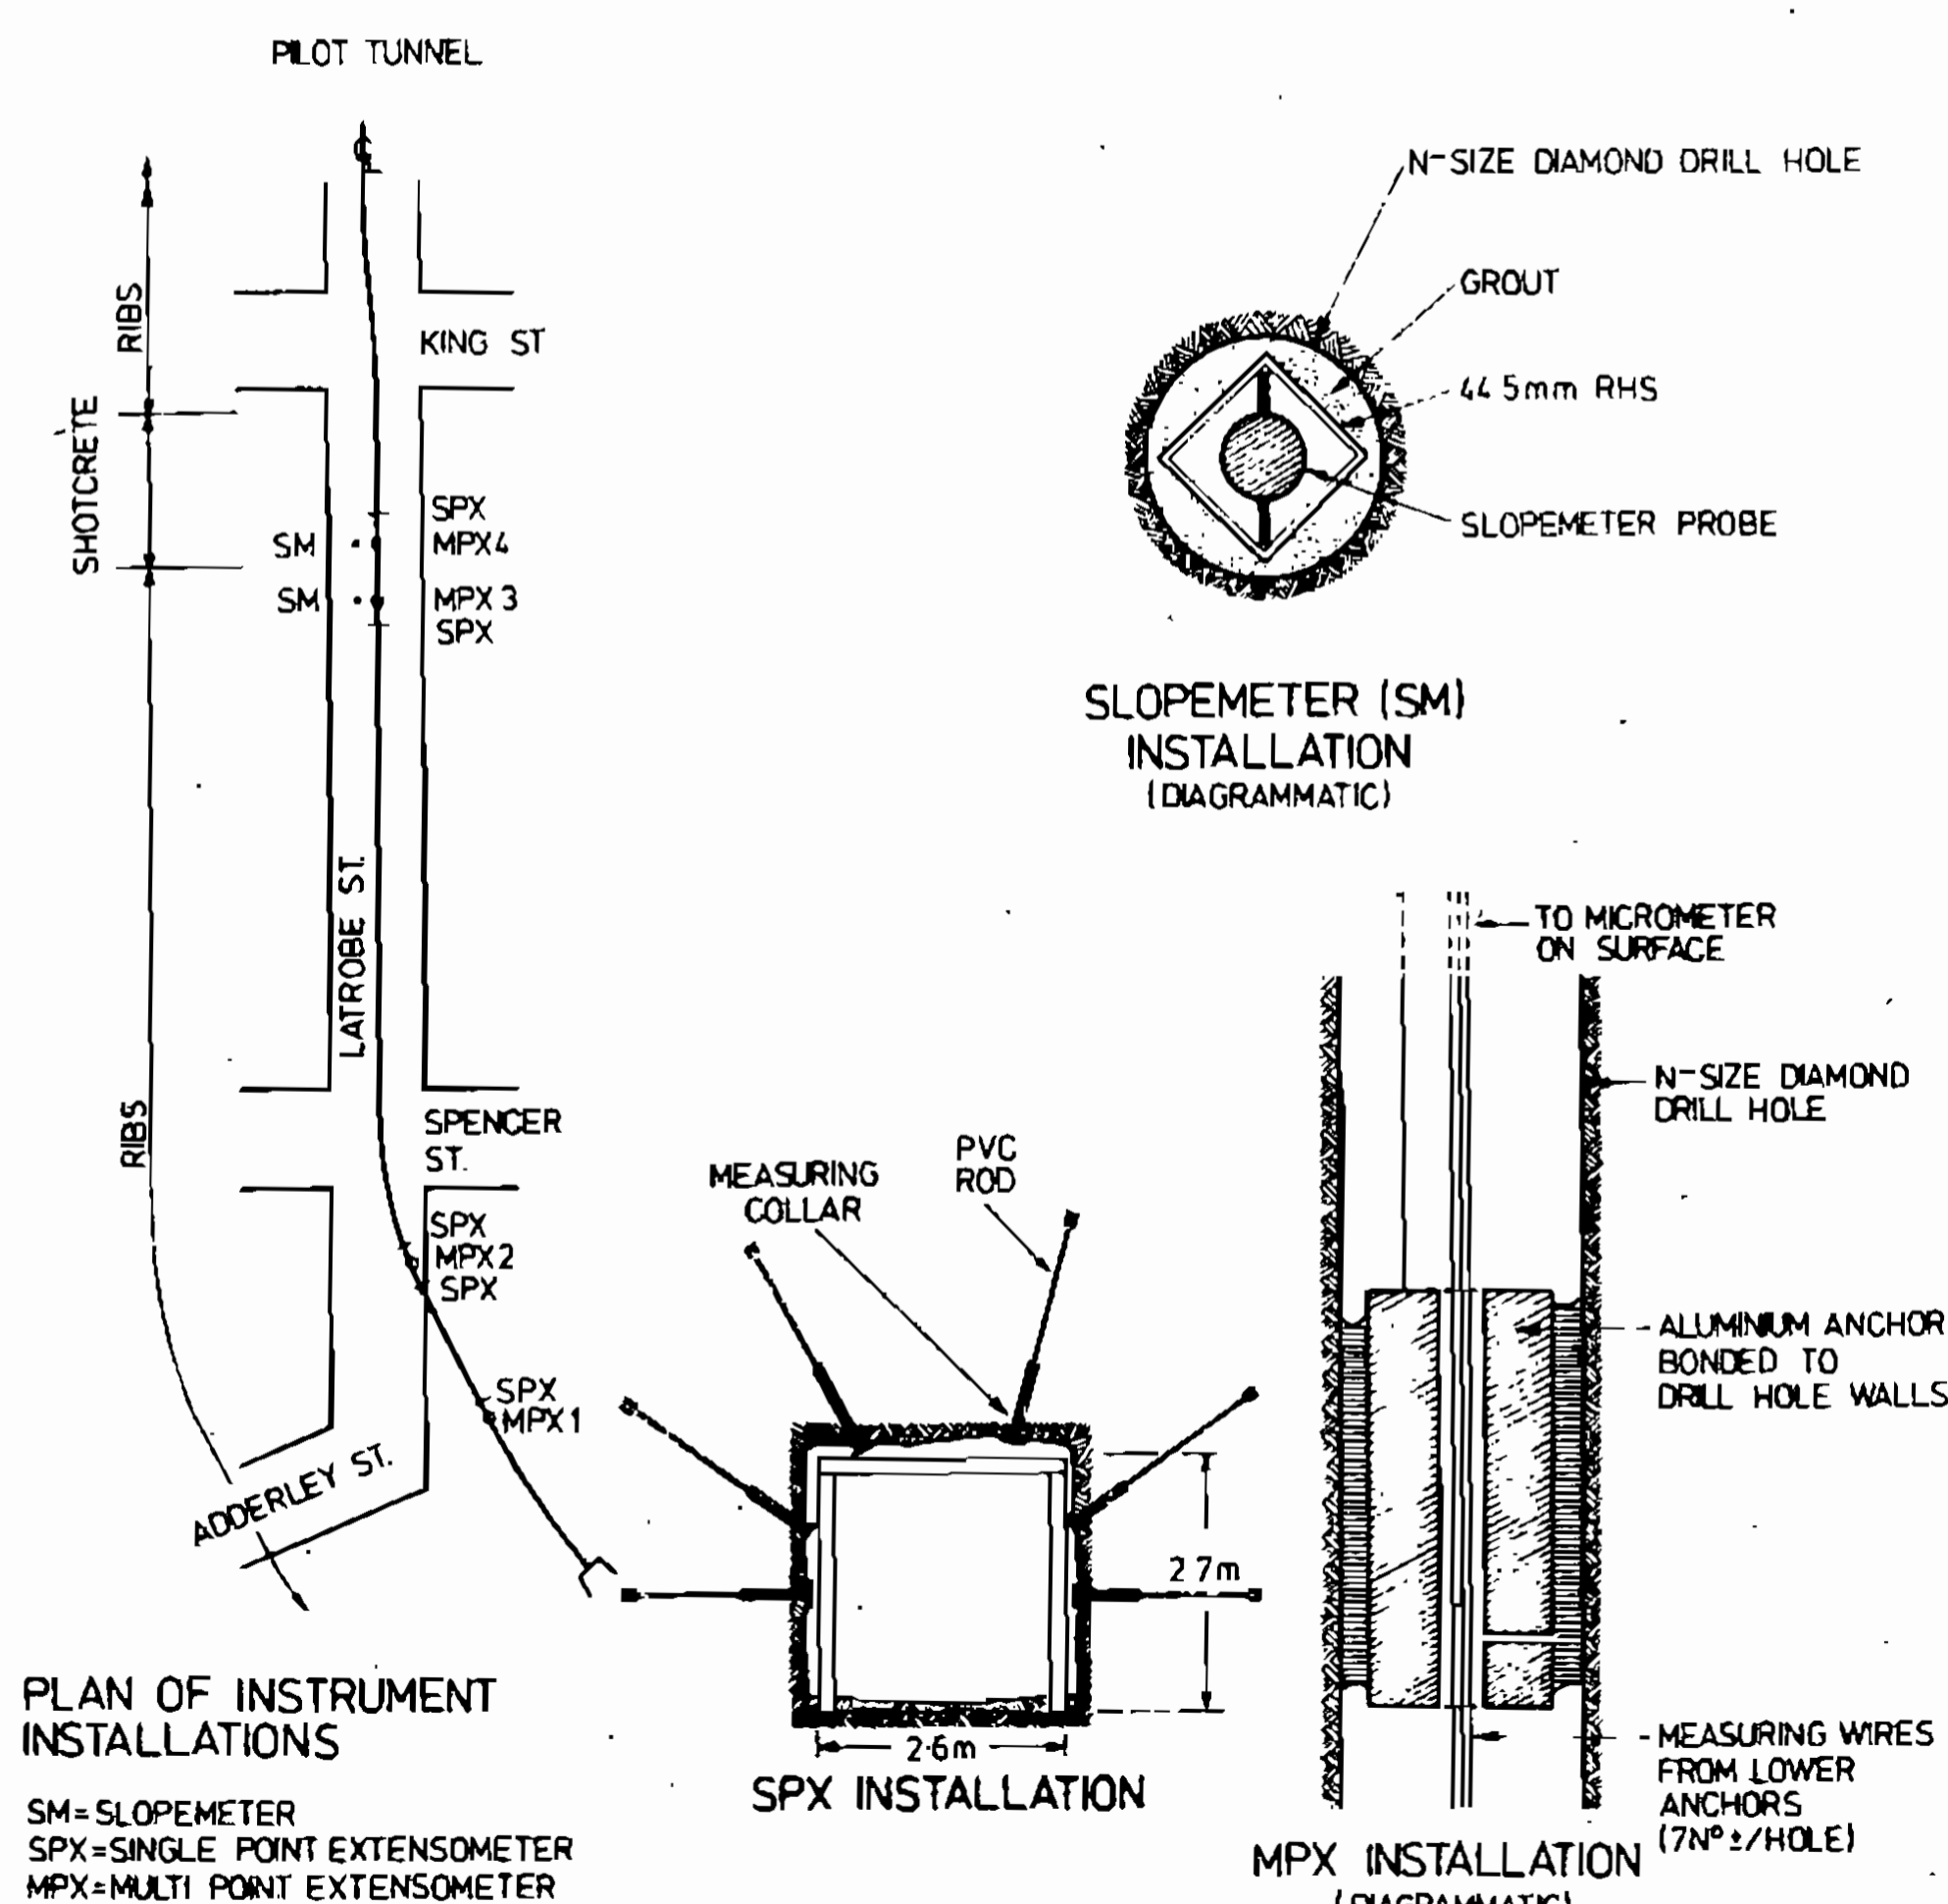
Monitoring Installations Adderley Street Pilot Tunnel
